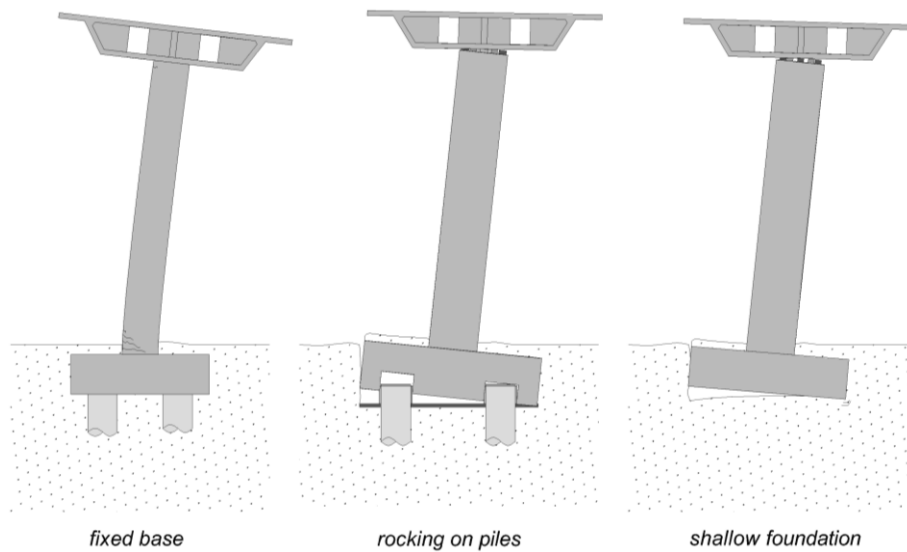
Schematic of foundation, column and deck in a deformed state at a 5% transverse drift ratio for the three designs studied (displacements are drawn magnified by 2).
